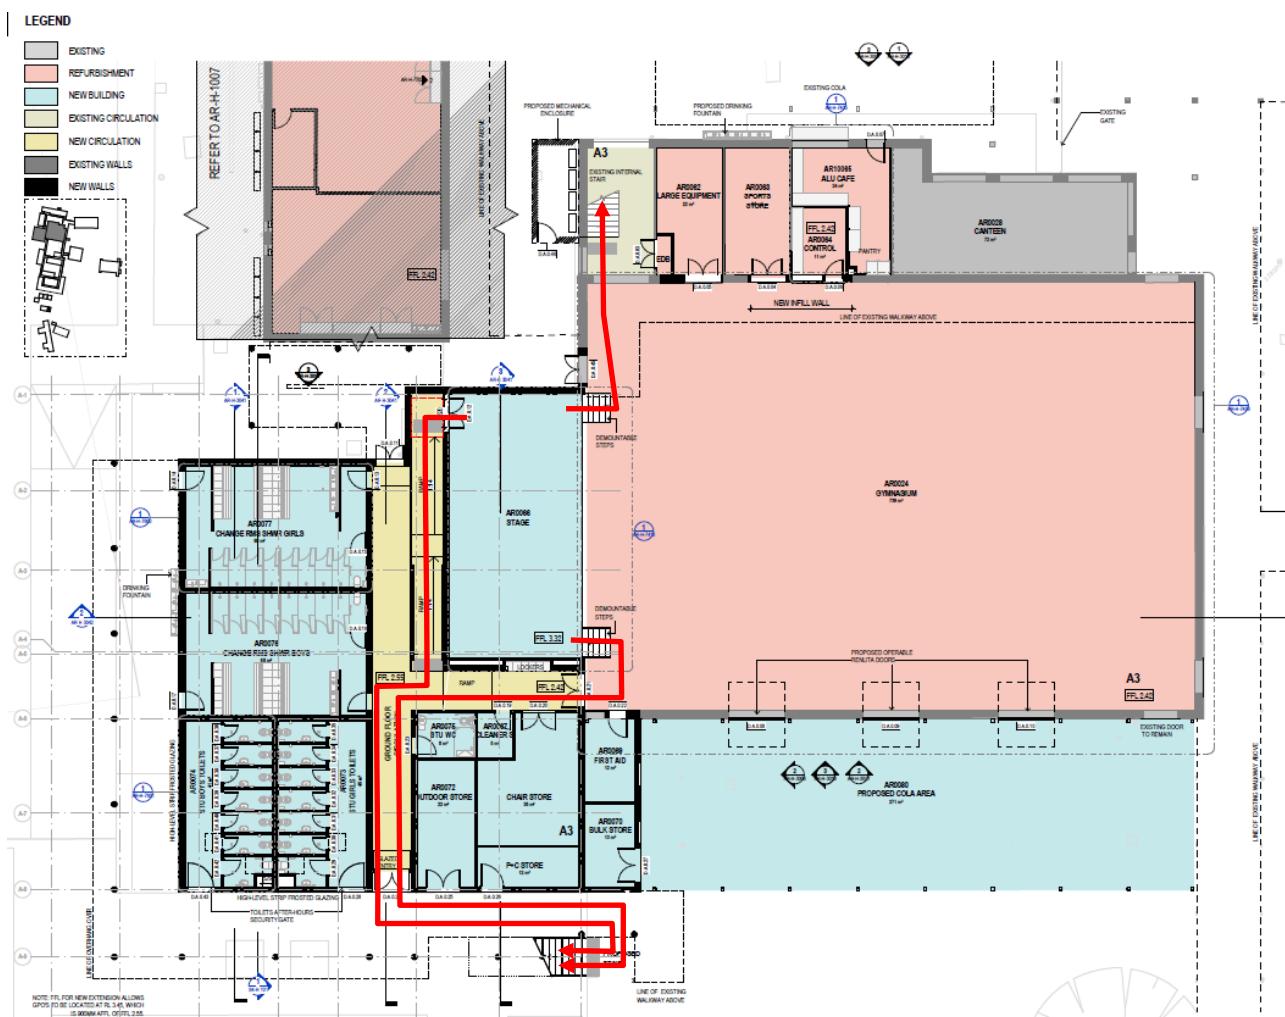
Access Routes from Stage to Level 1 of Building A (refer red arrows)
